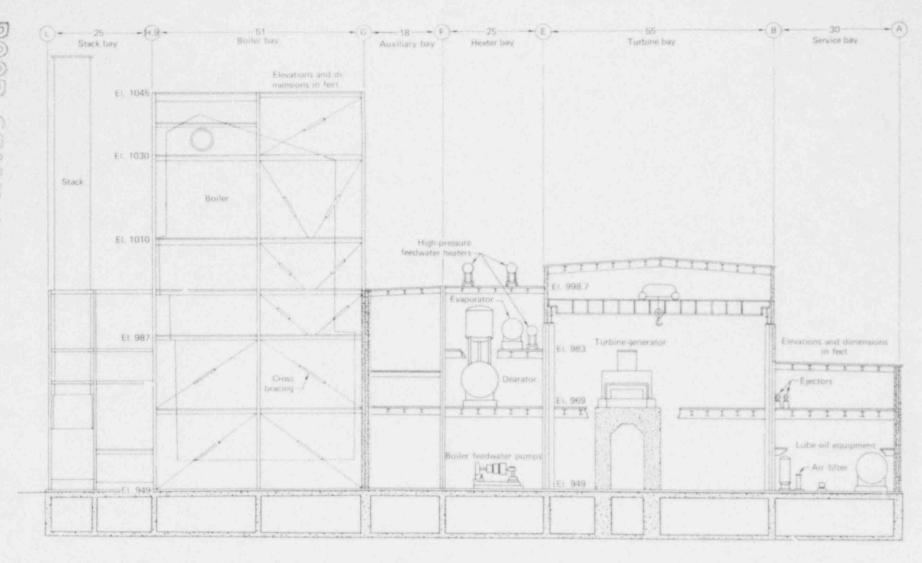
Elevation drawing, looking north, of the El Centro Steam Plant, Unit 4. Note single honeycomb-like foundation.
